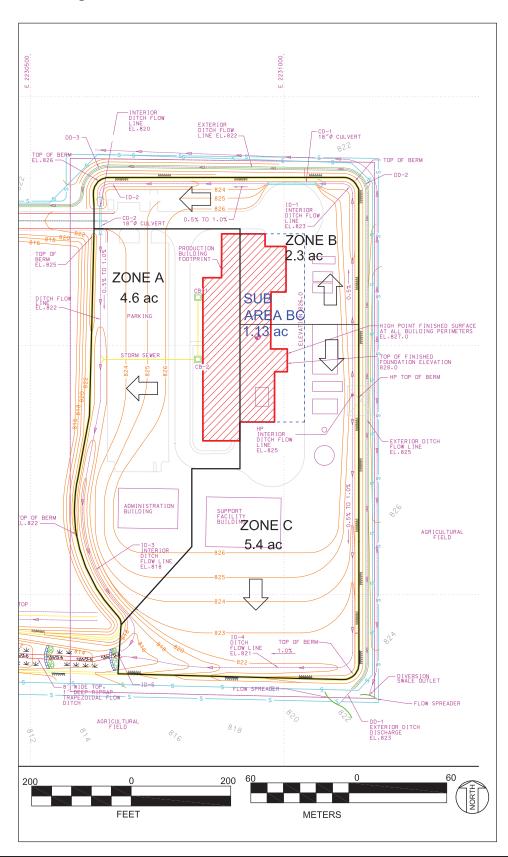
Plan - PMP Zones for SHINE Site Area
